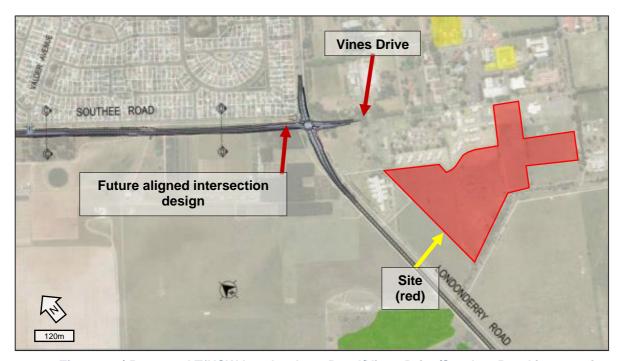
| Proposed TfNSW Londonderry Road/Vines Drive/Southee Road intersection upgrade (Source: Applicant's RtS 2021)
